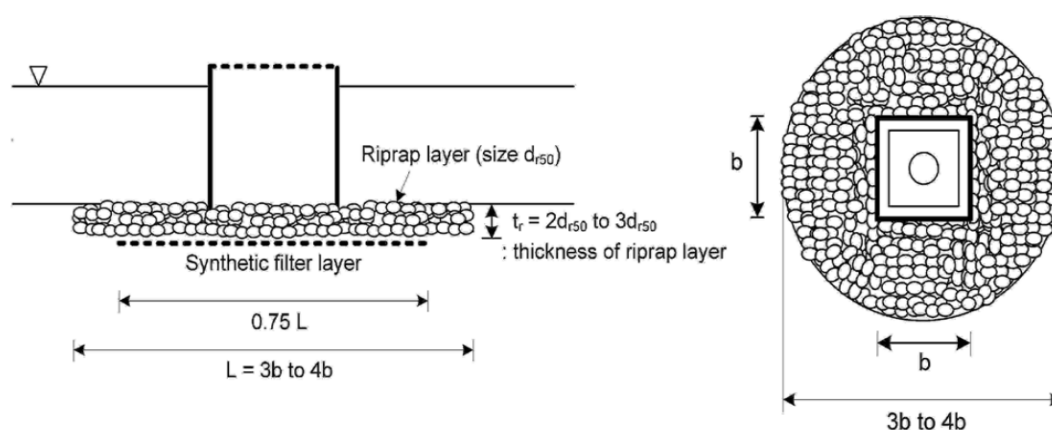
Recommendation for riprap layer around bridge pier (Lauchalan and Melville, 2001)
